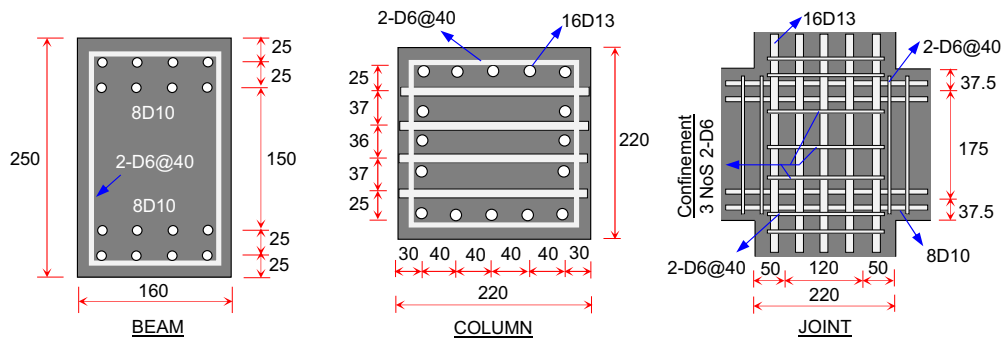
Schematic cross-section dimensions and bar layouts in specimen FM/A1 (adapted from [10]).
